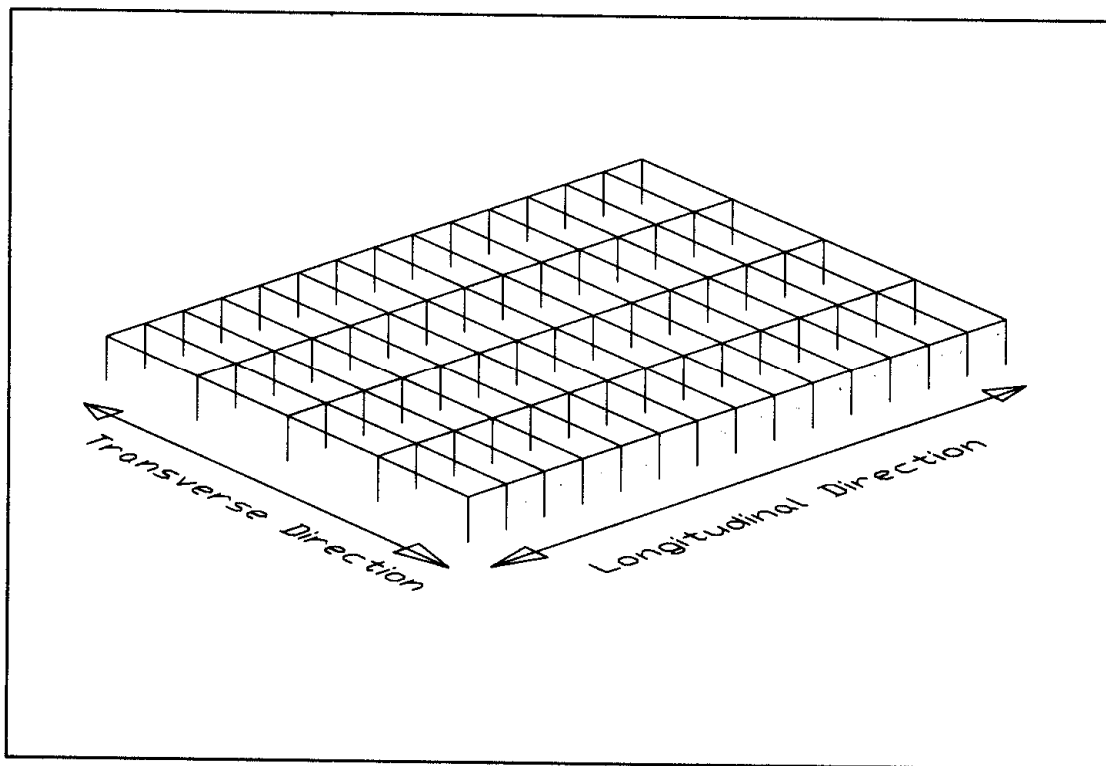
Typical Geometry of One-story Precast Frames (Posada, 2001)
